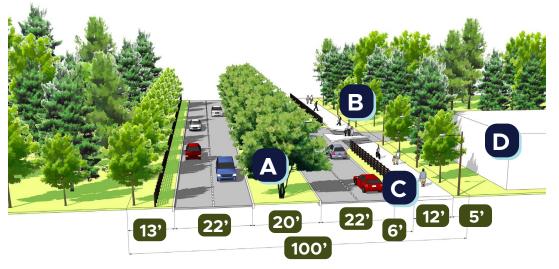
Arnold Mill Street Section 2: 110-Foot Right of Way
